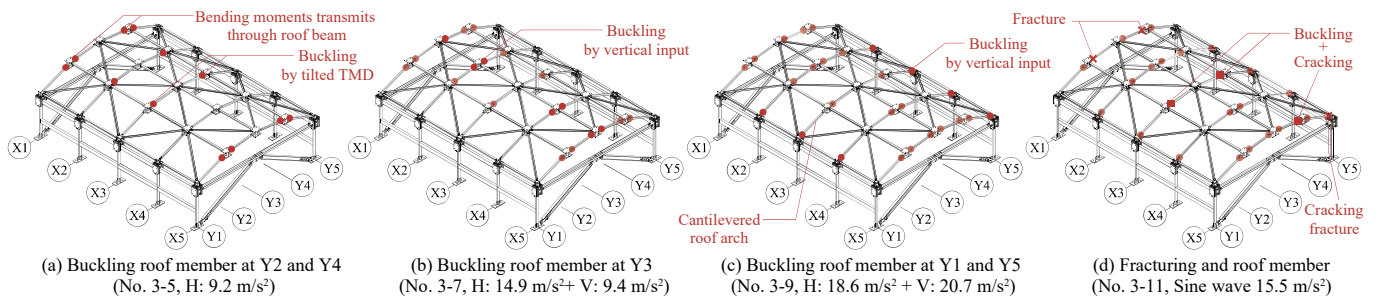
Collapse mechanism of the cylindrical lattice arch roof
